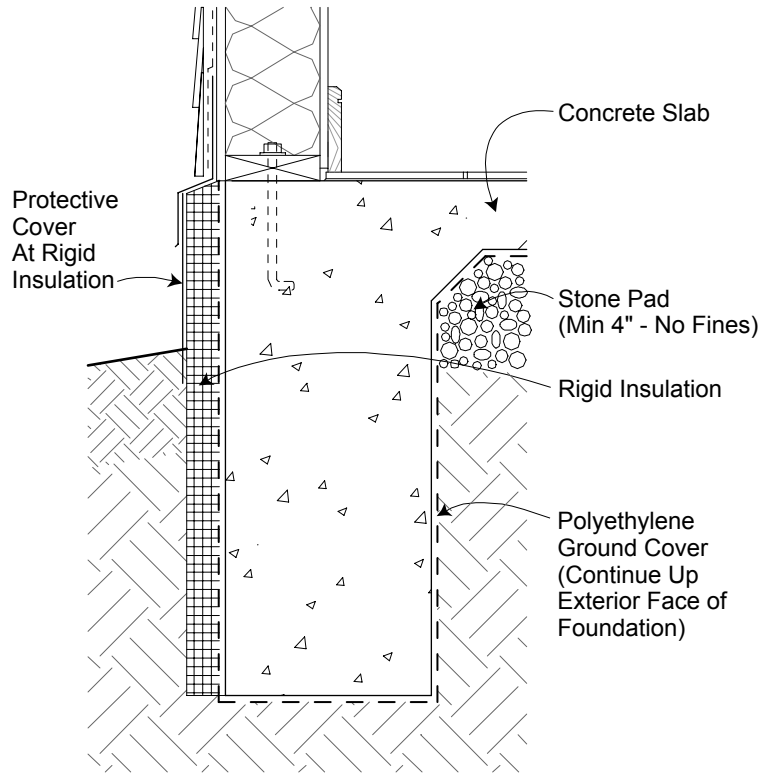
Slab at grade –polyethylene under turned down edge and rigid insulation along perimeter of slab foundation.
